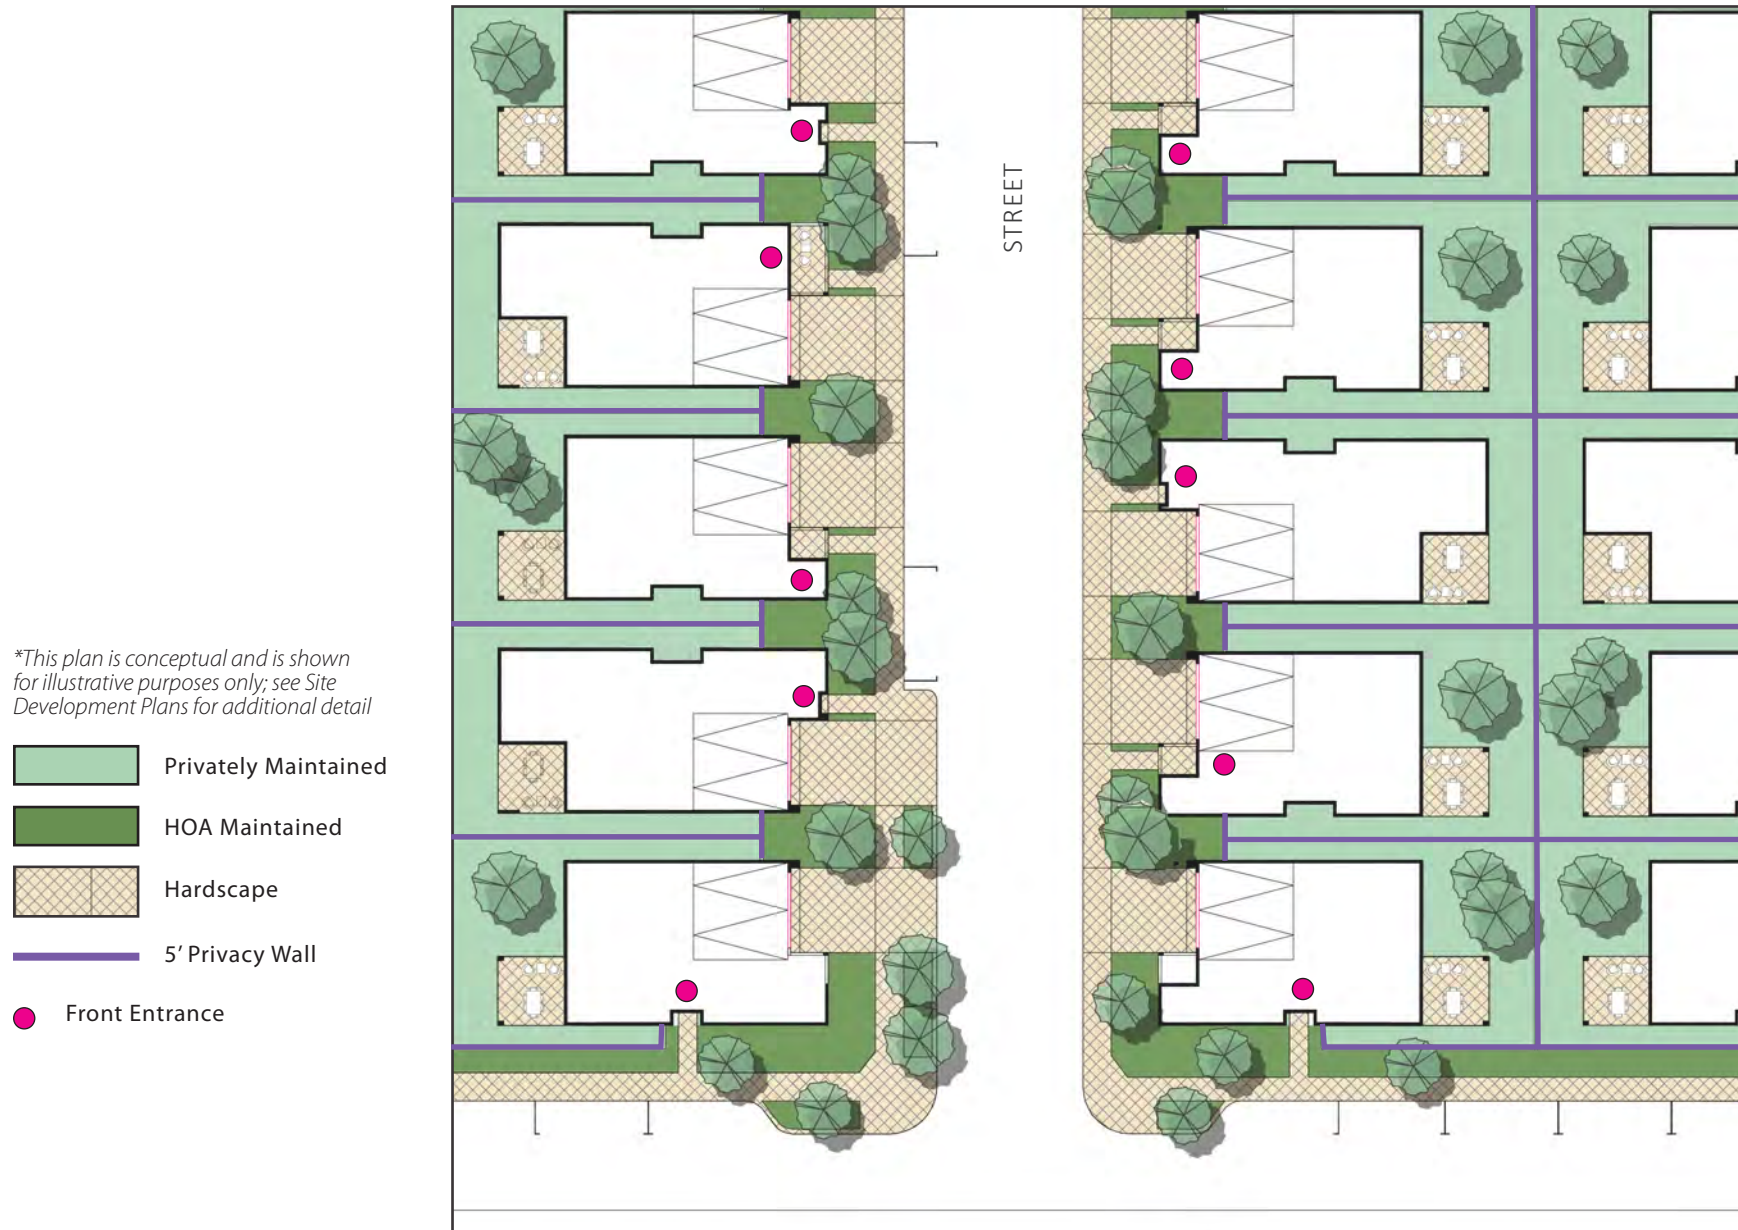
Type A Single-Family - Standard Lot Plan and Minimum Setbacks
